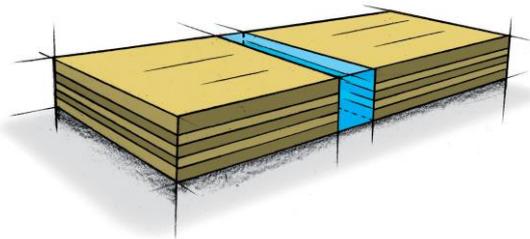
Timber Structures 3.0: Butt joint bonding technology
